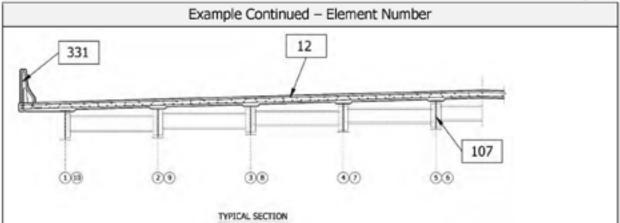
Typical bridge superstructure cross-section view from construction plans for a steel multi-beam bridge. (Source: Alabama DOT)
